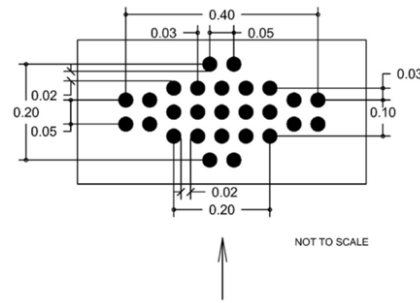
Plan of Oyster Reef Pile Structure in Diamond Shape –
